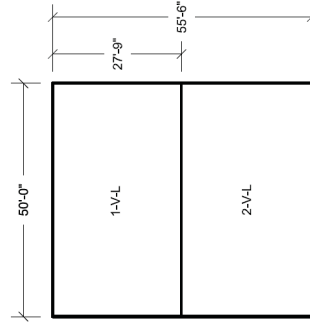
H-6-114: COOLING TOWER EAST WALL LOOKING WEST
